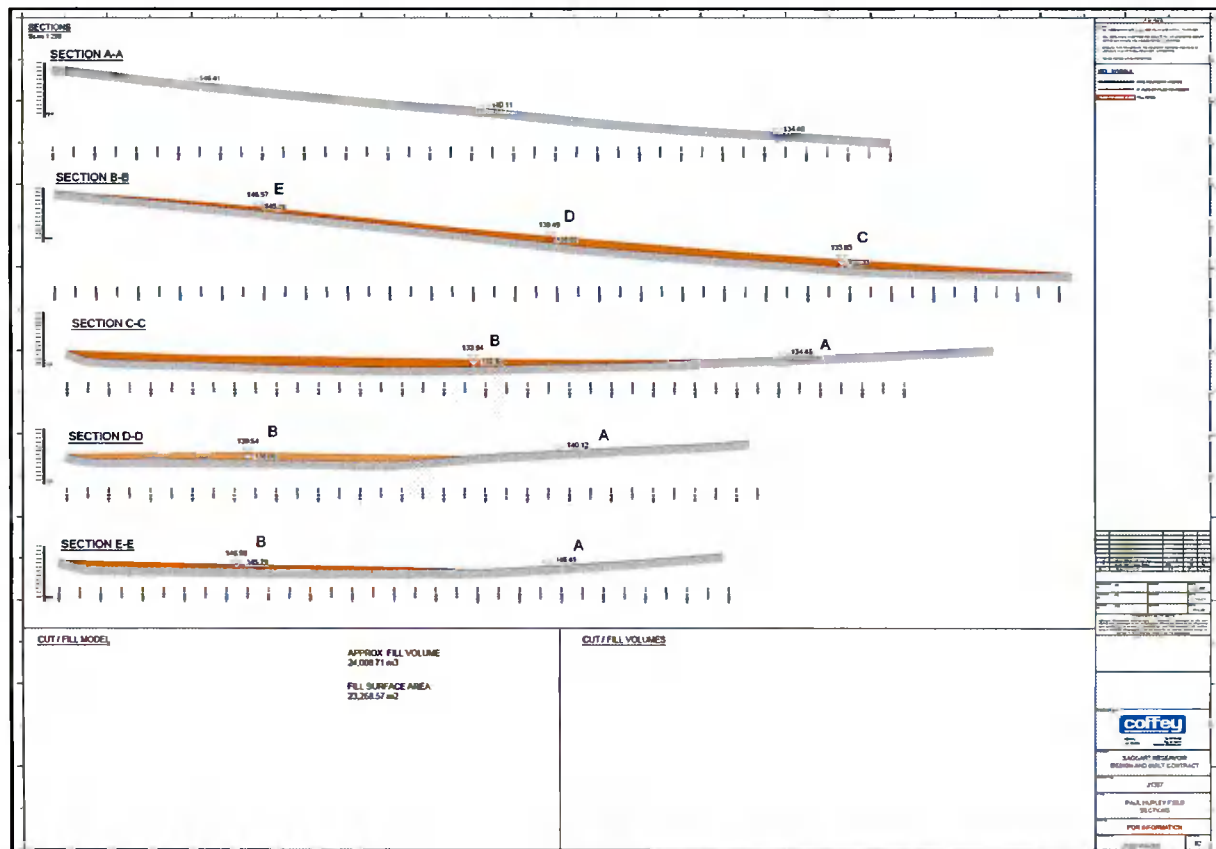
Extracts from cross sections of the site (Refer to Planning drawing J1387-PH-003)
